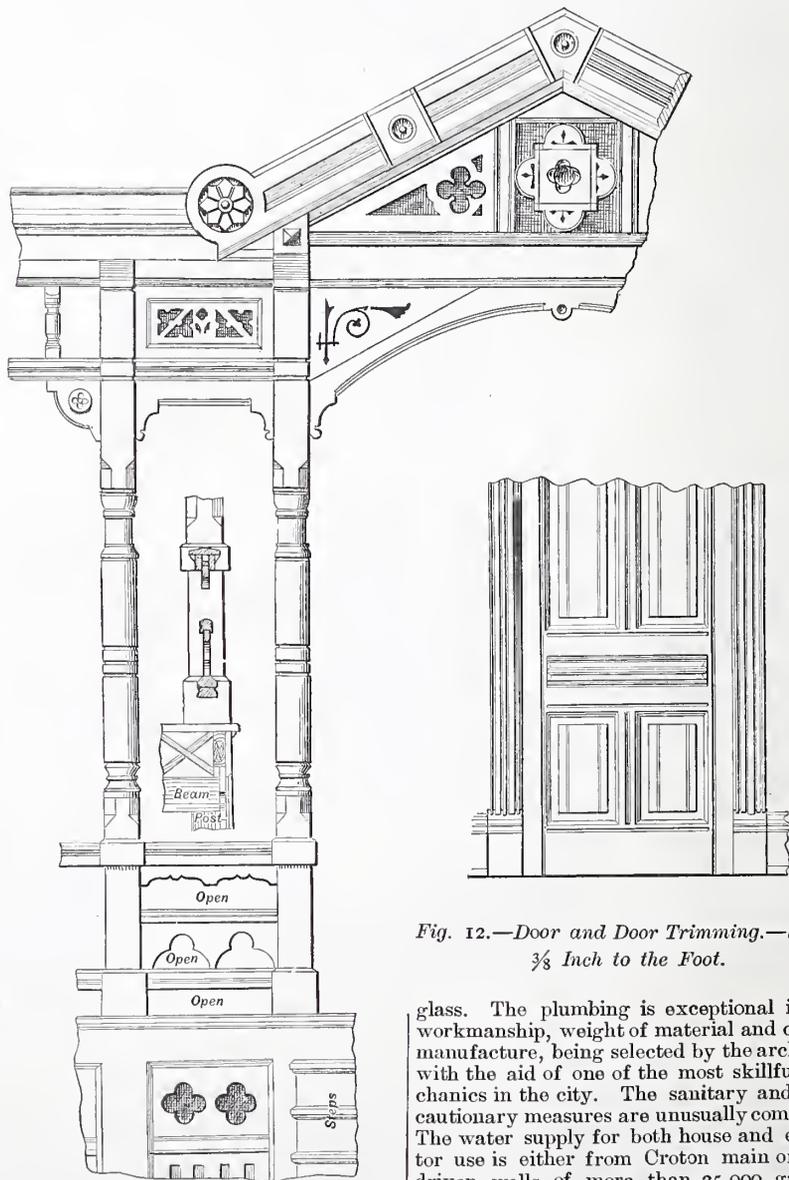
Door and Door Trimming.—Scale, 3/8 Inch to the Foot.
